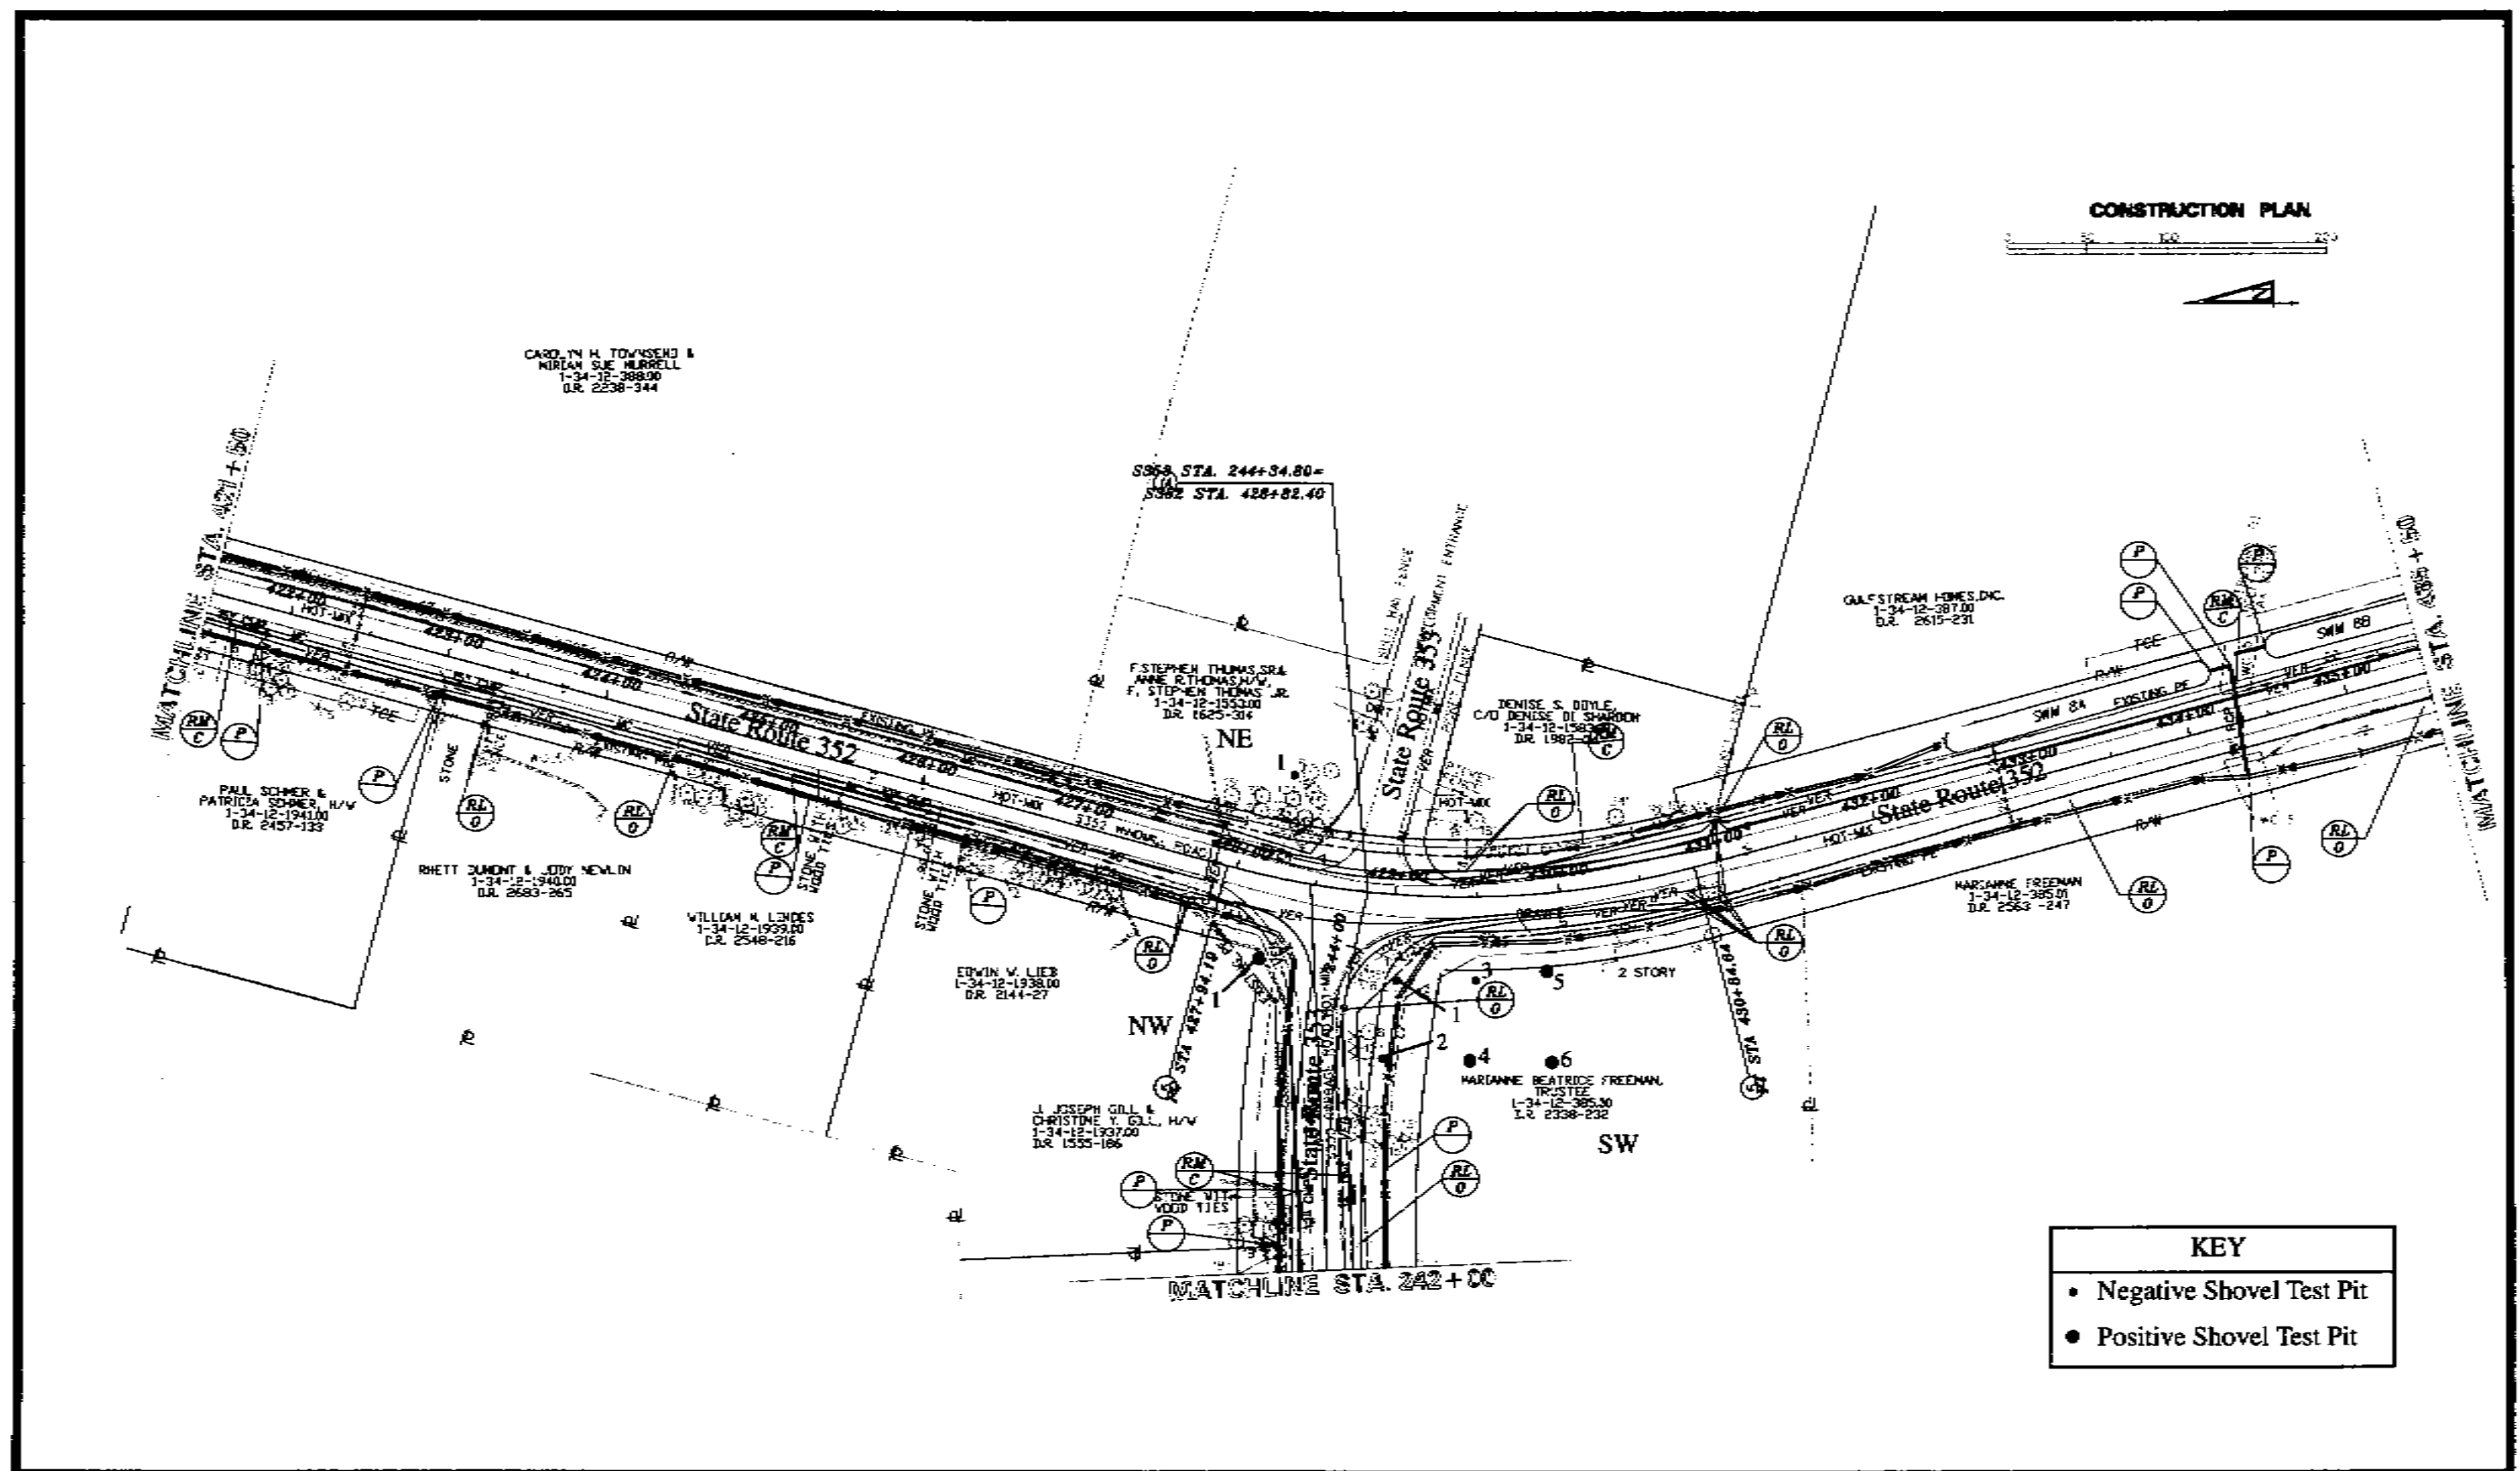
Test Area 2, Showing Locations of Shovel Test Pits.
